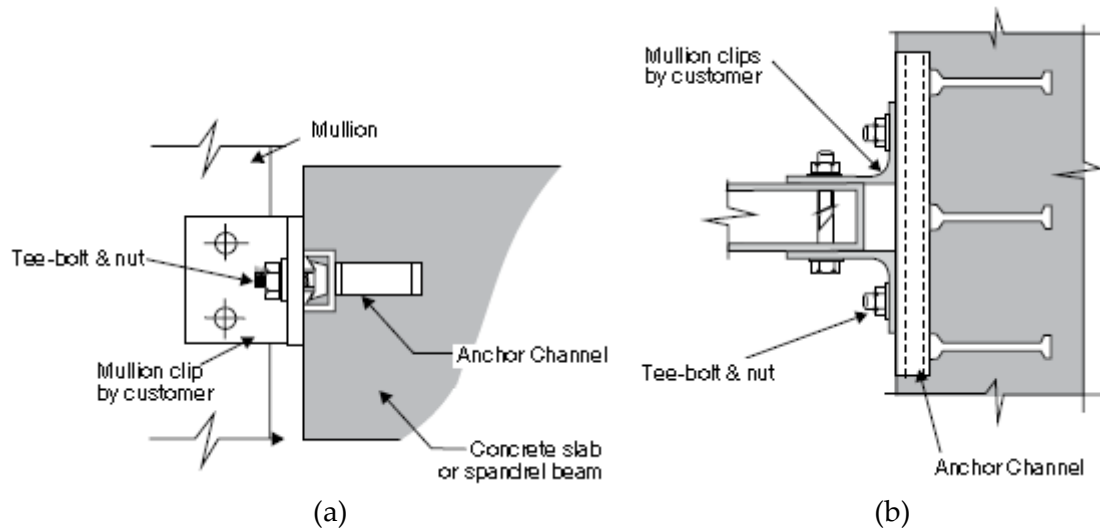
Profile view of a typical edge of slab cast-in-place channel embed with bolted anchor clip assembly from (a) the side and (b) overhead (www.halfenusa.com)
